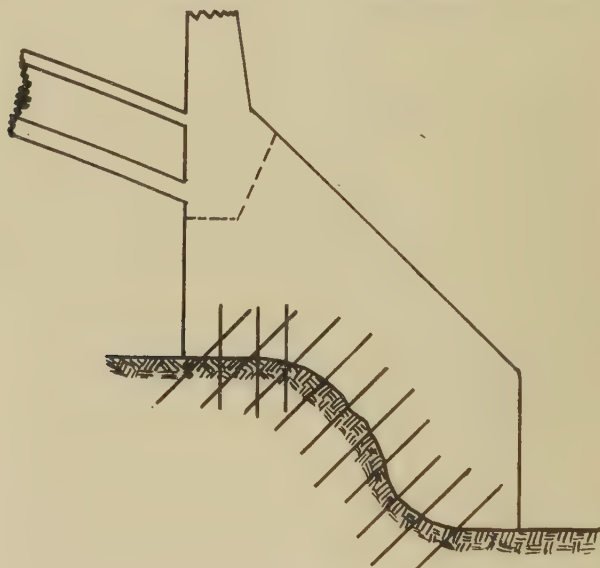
SCHEME OF ANCHORING, EAST ABUTMENT.
